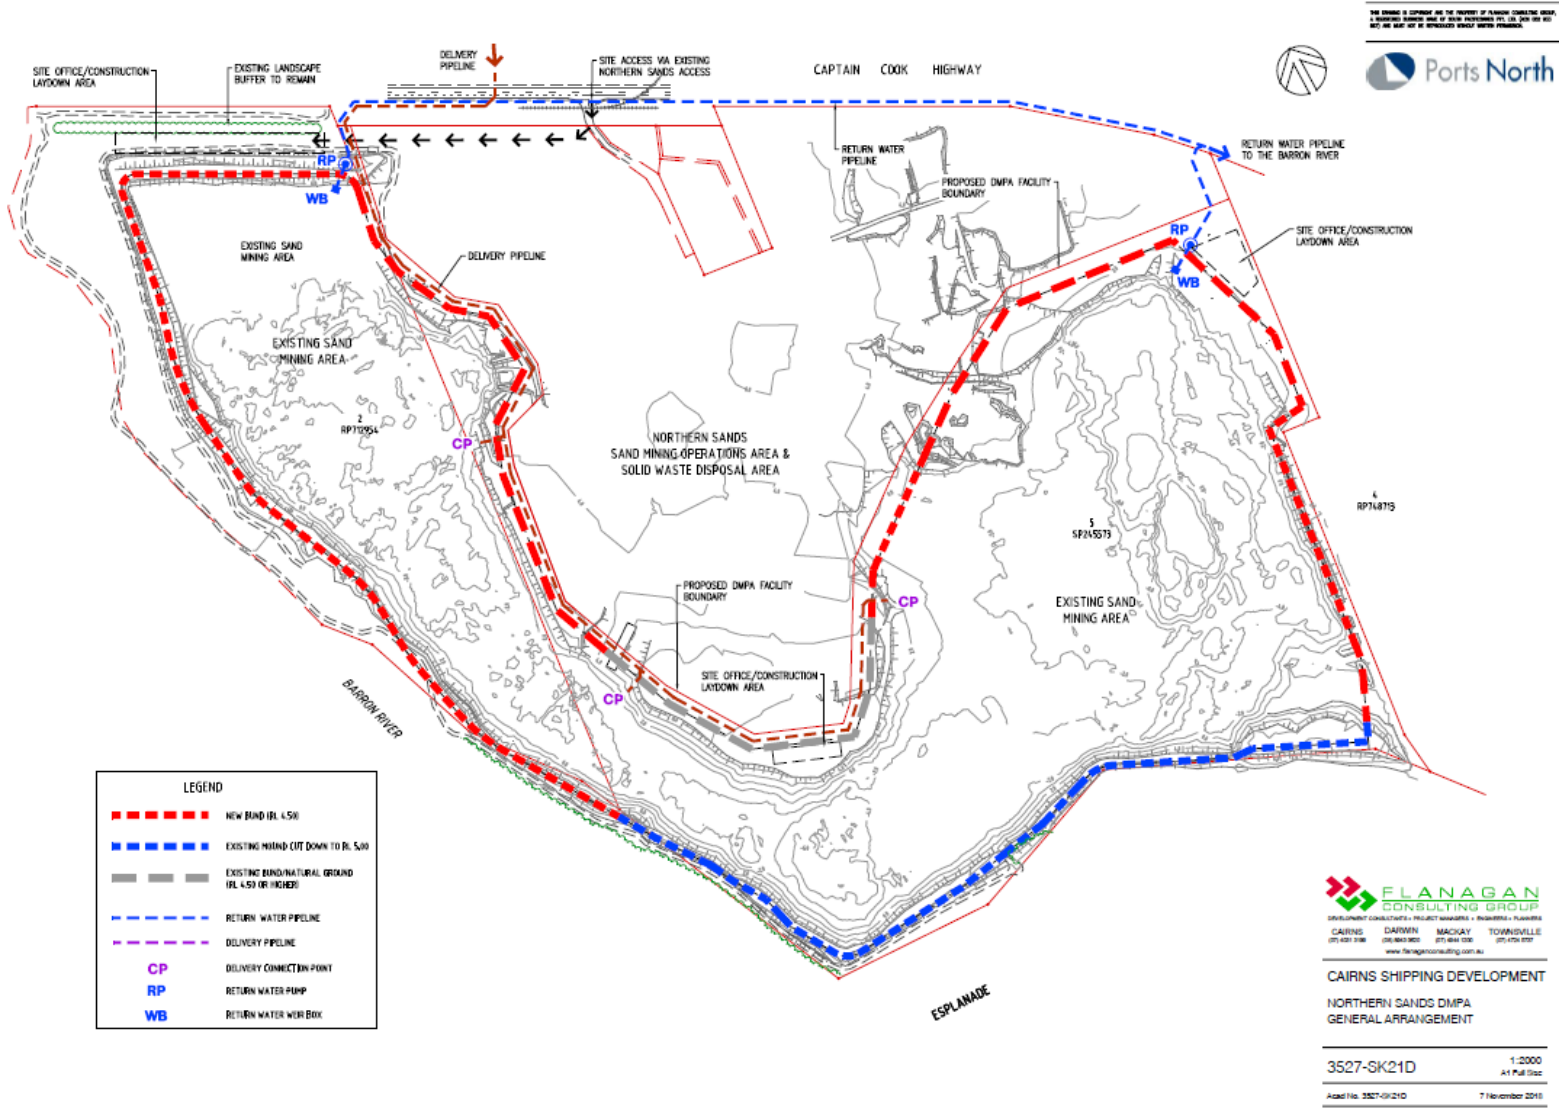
General Arrangement of Bund Walls at Northern Sands
